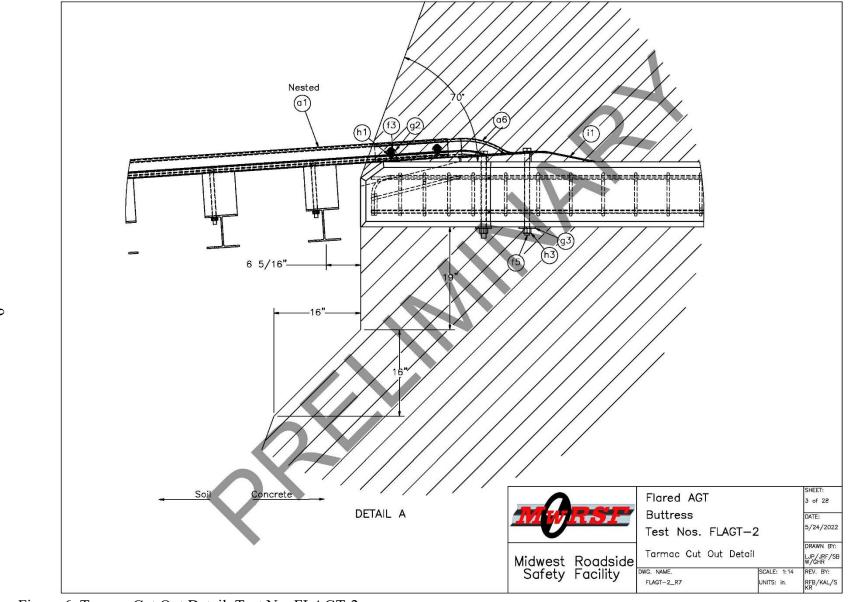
Tarmac Cut Out Detail, Test No. FLAGT-2
